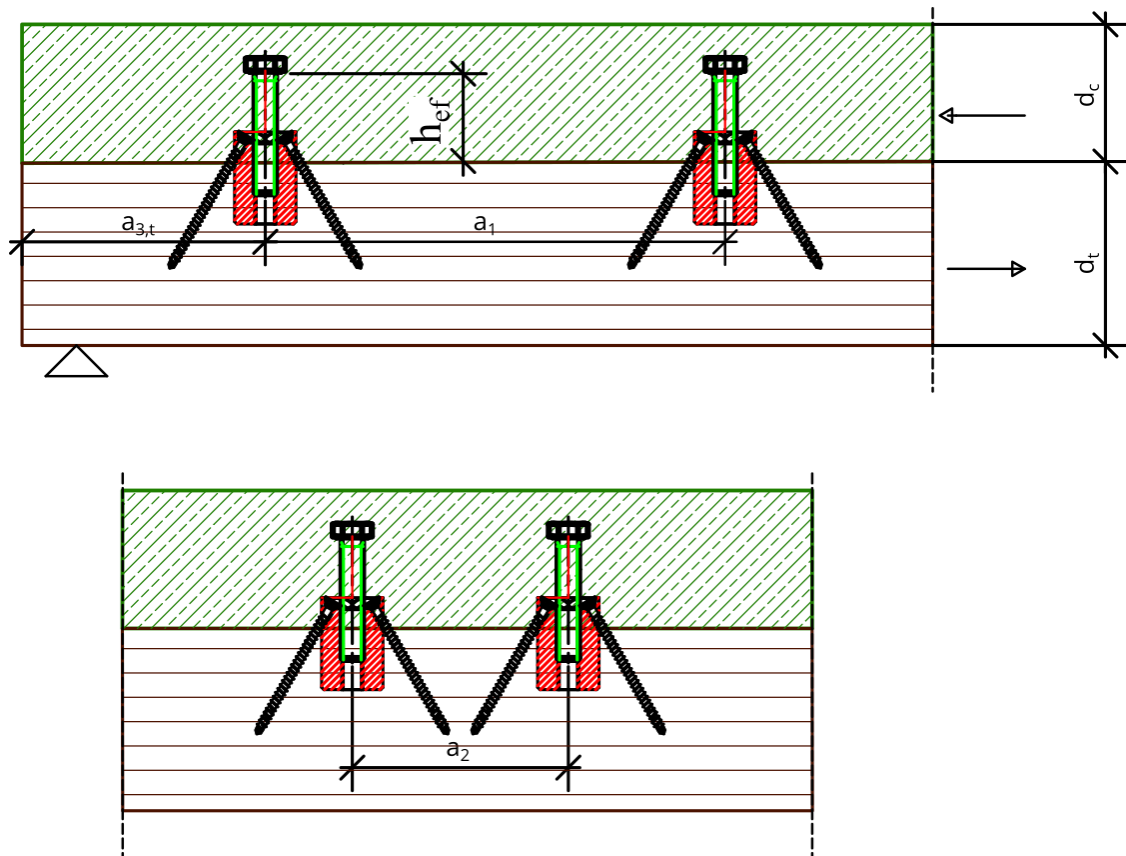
Elevation on (above) and cross-section through (right) a composite member with shear bolt
